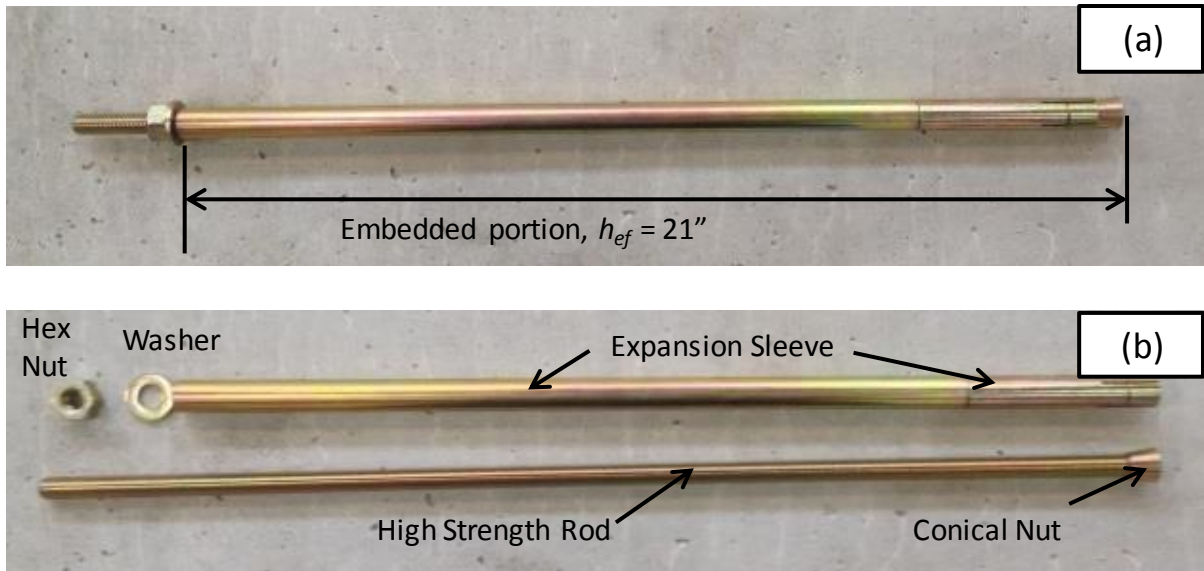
Undercut anchor system. (a) constructed anchor; (b) anchor components
